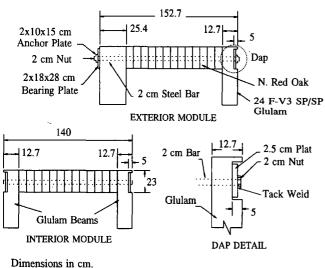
Cross section of the Camp Arrowhead bridge.
